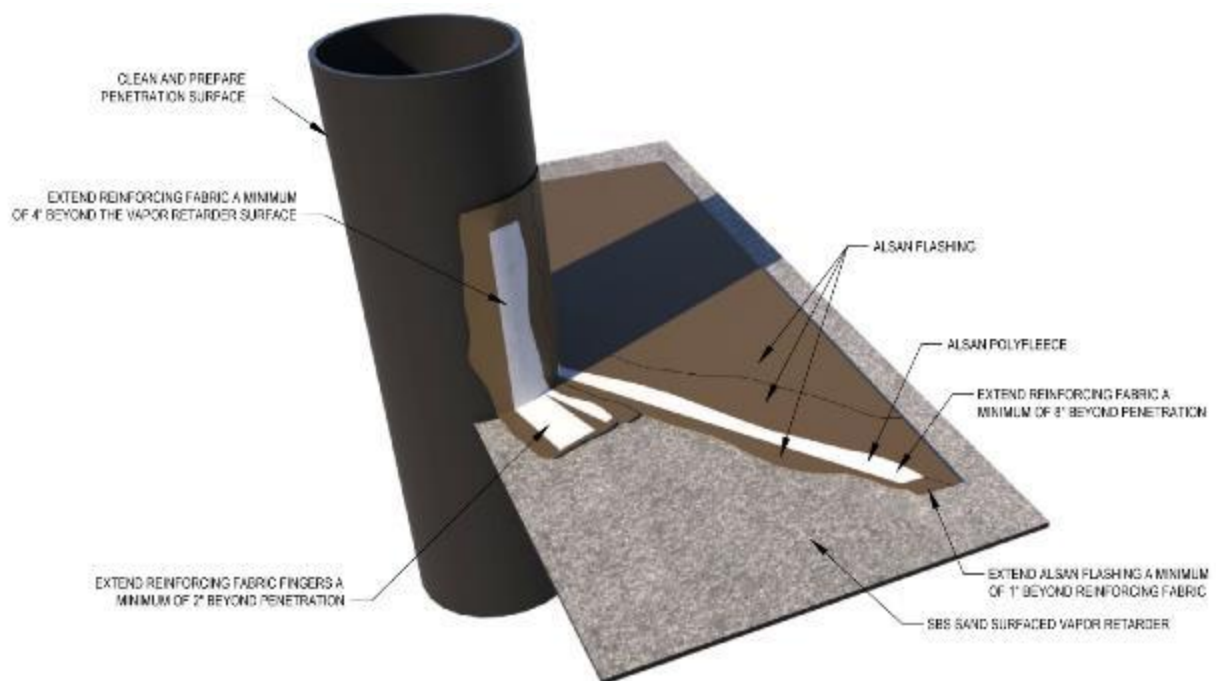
ALSAN® FLASHING Penetration Flashing on Vapor Retarder
